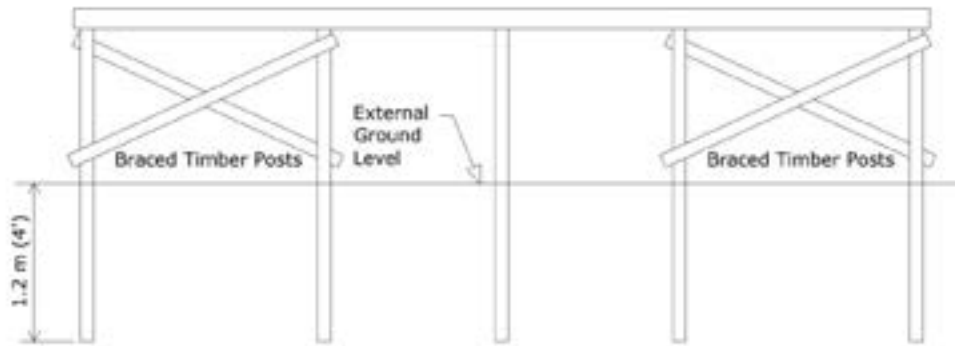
BRACED TIMBER POST FOUNDATION
